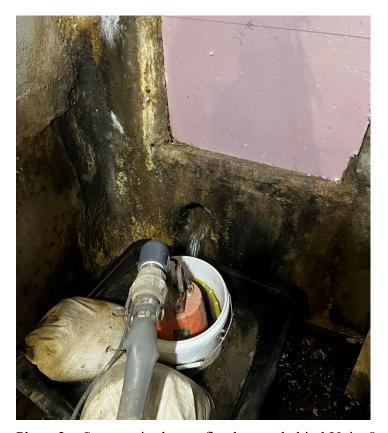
Seepage in the confined space behind Units 8 to 11 being collected and pumped into a drain
